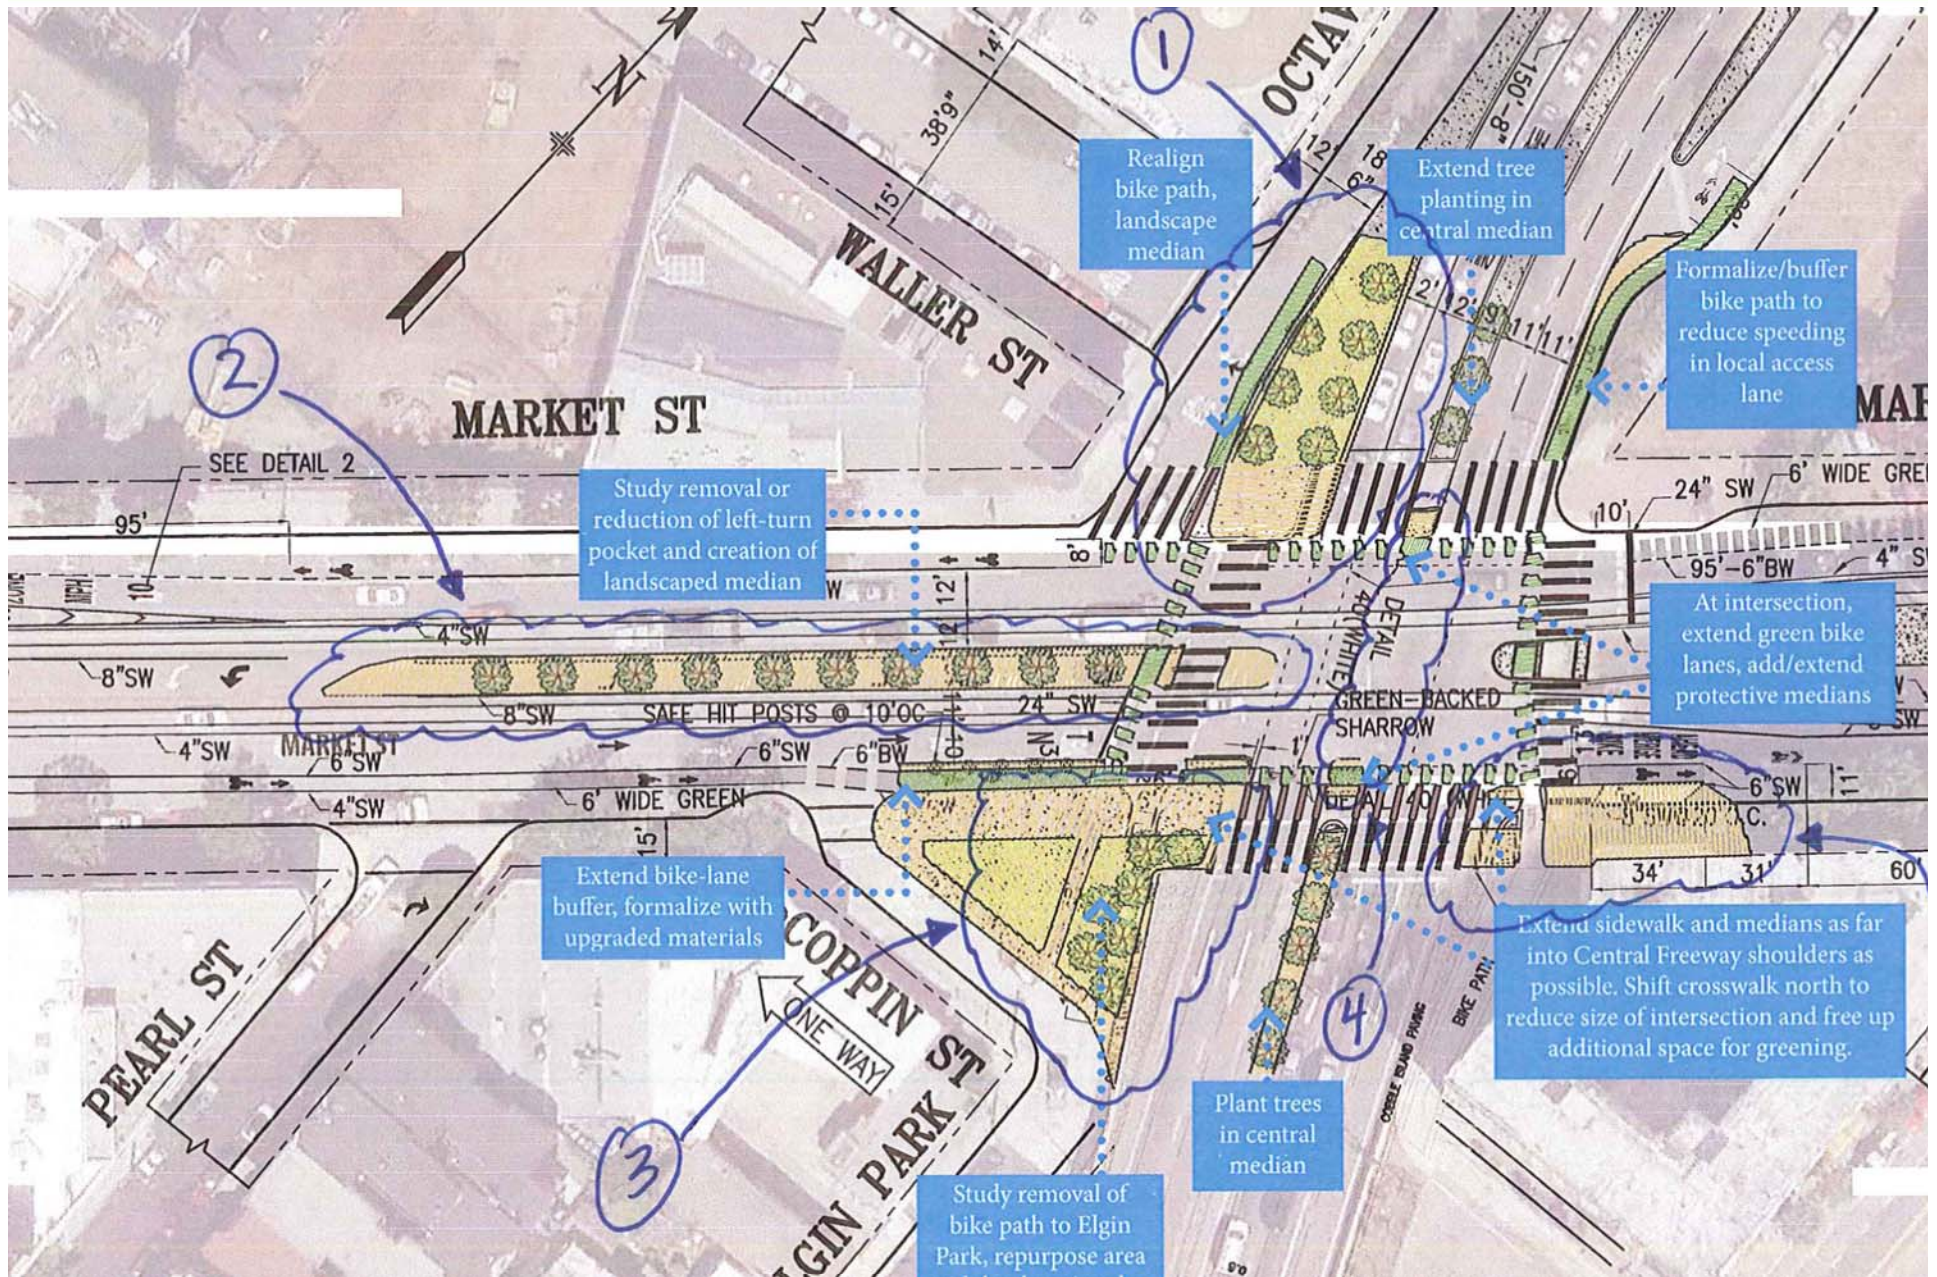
B EXISTING MARKET STREET INTERSECTION AT OCTAVIA BOULEVARD
